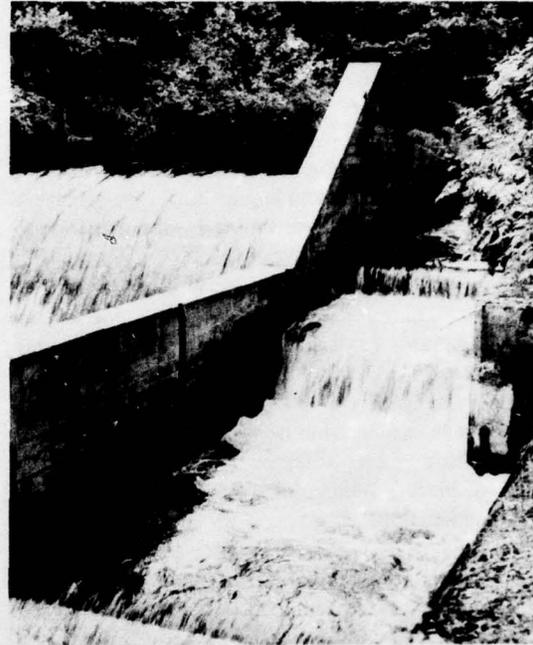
Fish-passage facilities are effective at some barriers. (Washington Department of Game photo)
